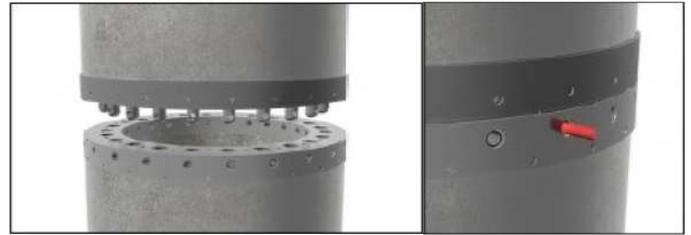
Detail of mechanical joint and assembly sequences / Particolare del giunto meccanico e sequenza di montaggio.
